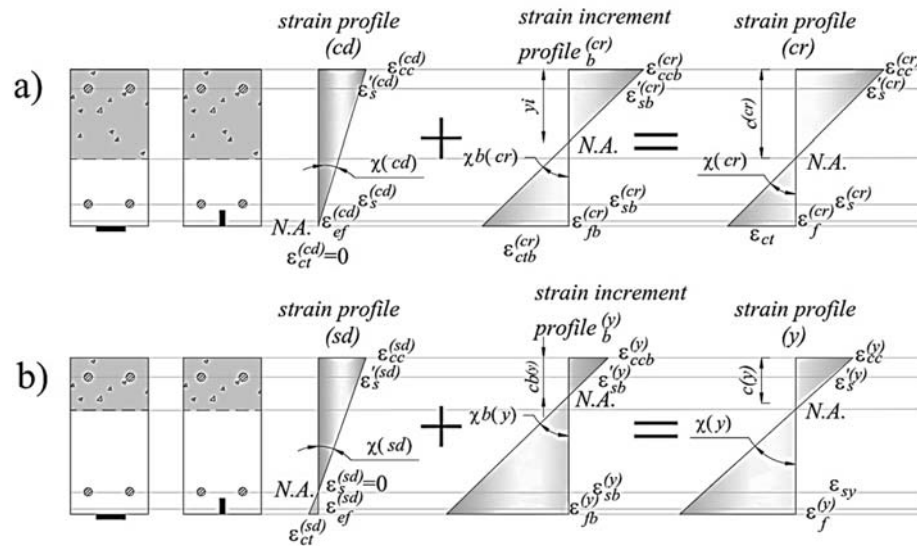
Strain profile of the cross section: a) at concrete crack initiation point (cr), b) at steel yield initiation point (y)
